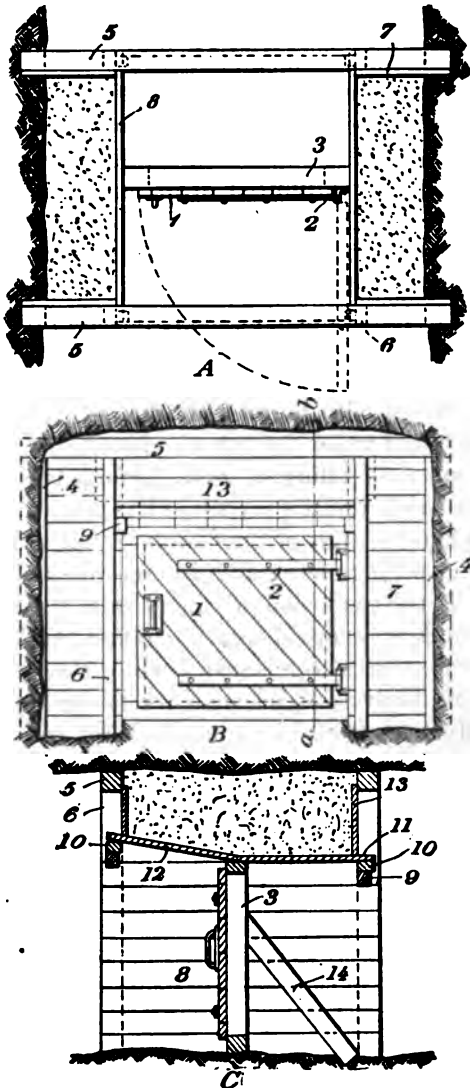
Rock-dust-protected ventilating door. *A*, plan; *B*, front elevation; *C*, vertical section through *a-b*.
